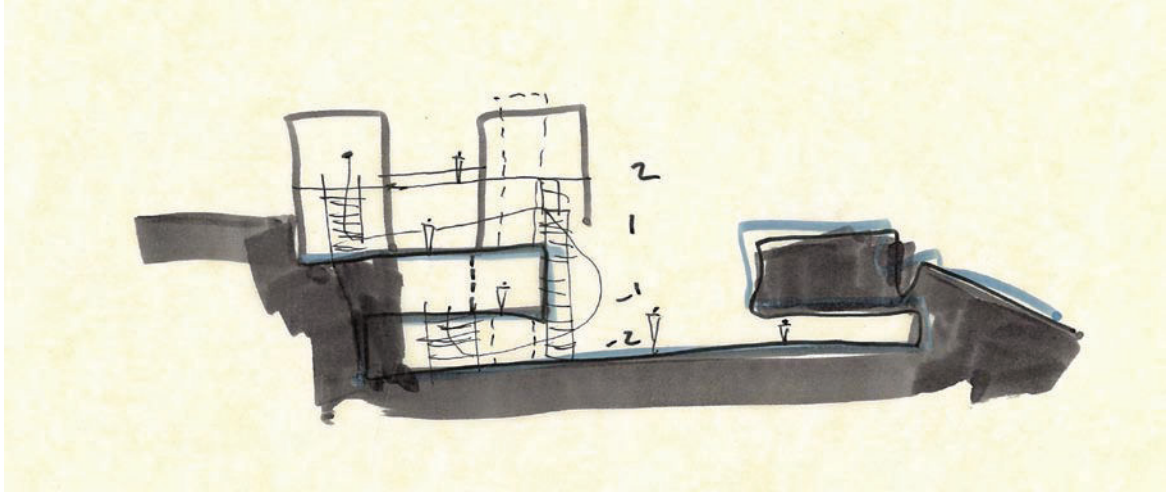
Diagrammatic process drawing of a section cutting North-South through the building looking East. This diagram shows the lobby space between the “town” gallery and ceremonial hall and the outdoor terrace between the ceremonial hall and the mining gallery [Drawing by Emily Childs].
